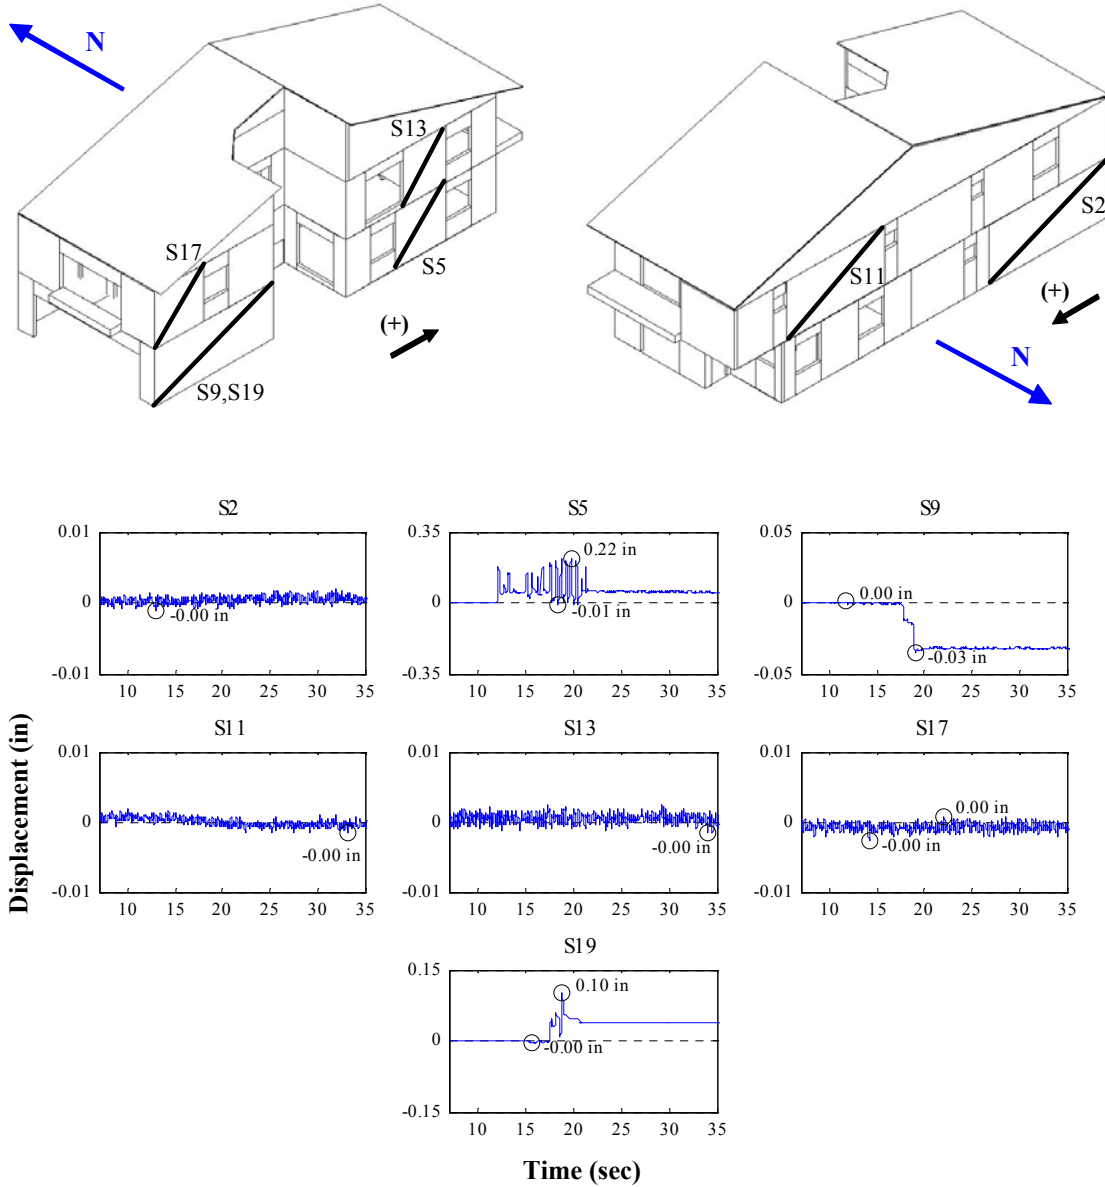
Wall deformations of east-west external walls for Test NWP5S03
